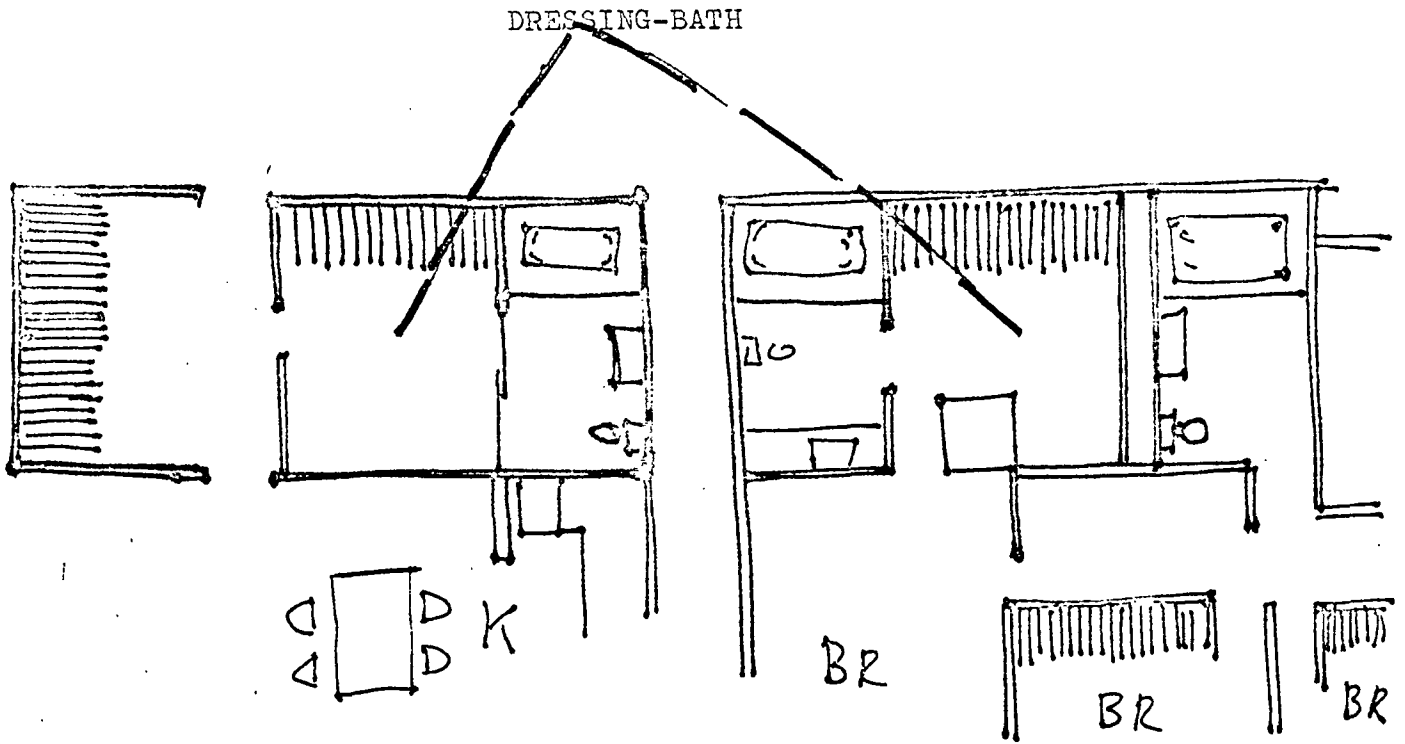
DRESSING AND BATHROOM AS ONE UNIT
